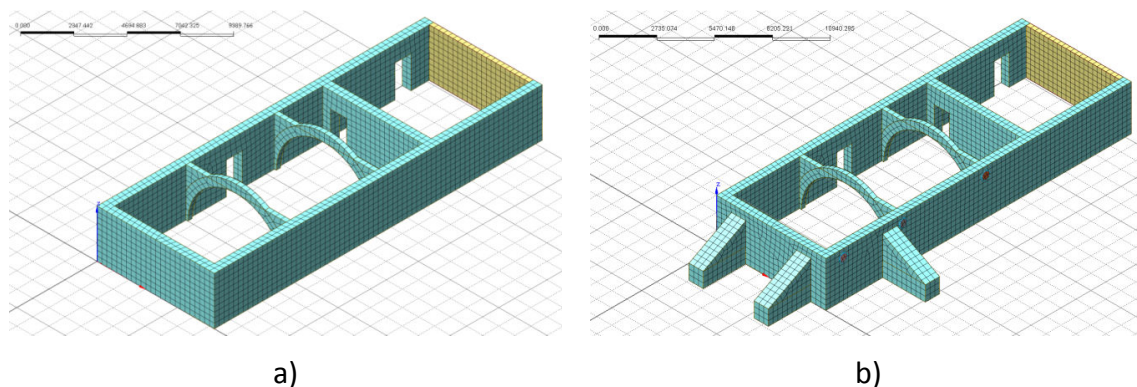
Numerical model; a) Base model; b) Model with foothills and ties reinforcement.
